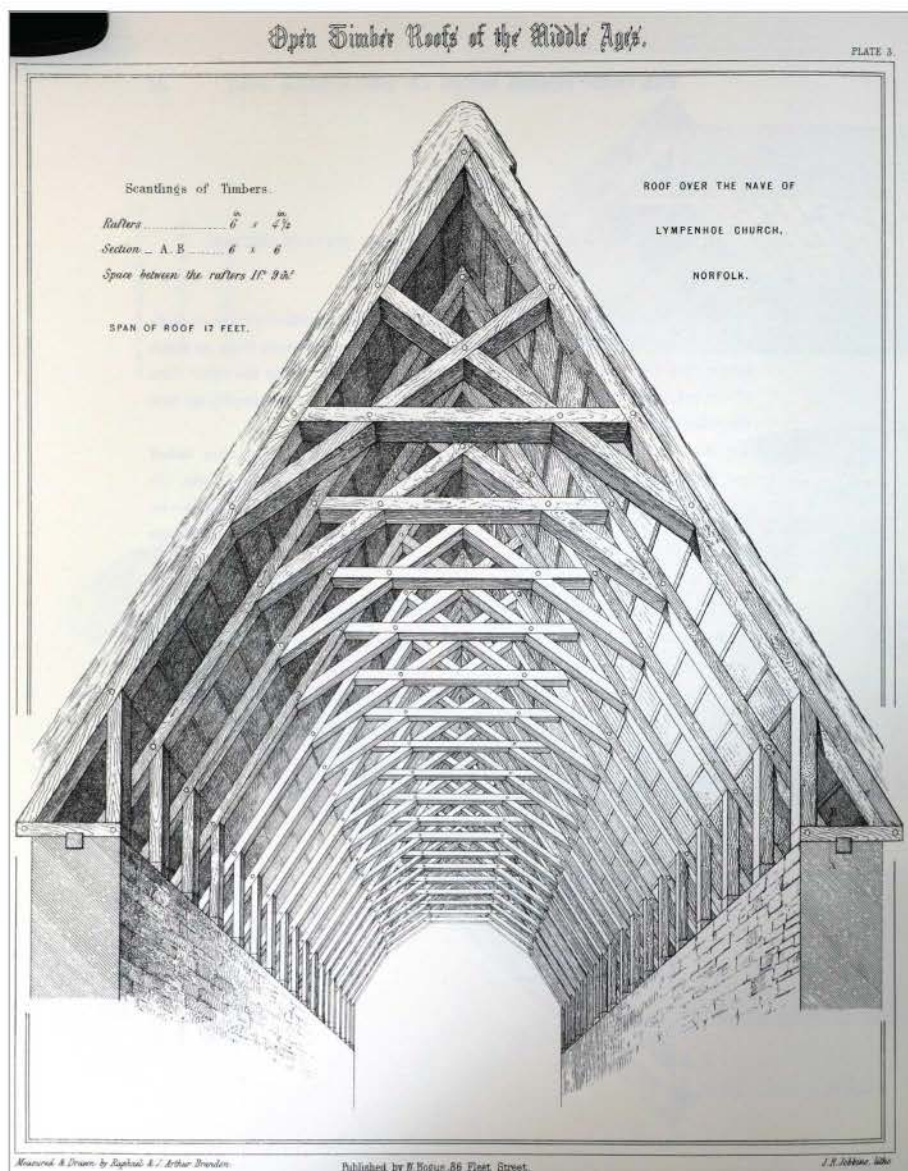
ROOF OVER THE NAVE OF LYMPENHOE CHURCH, NORFOLK (UK). | ILLUSTRATED IN BRANDON AND BRANDON, 1847, *OPEN TIMBER ROOFS*. SPECIAL THANKS TO MALCOLM THURLBY.
